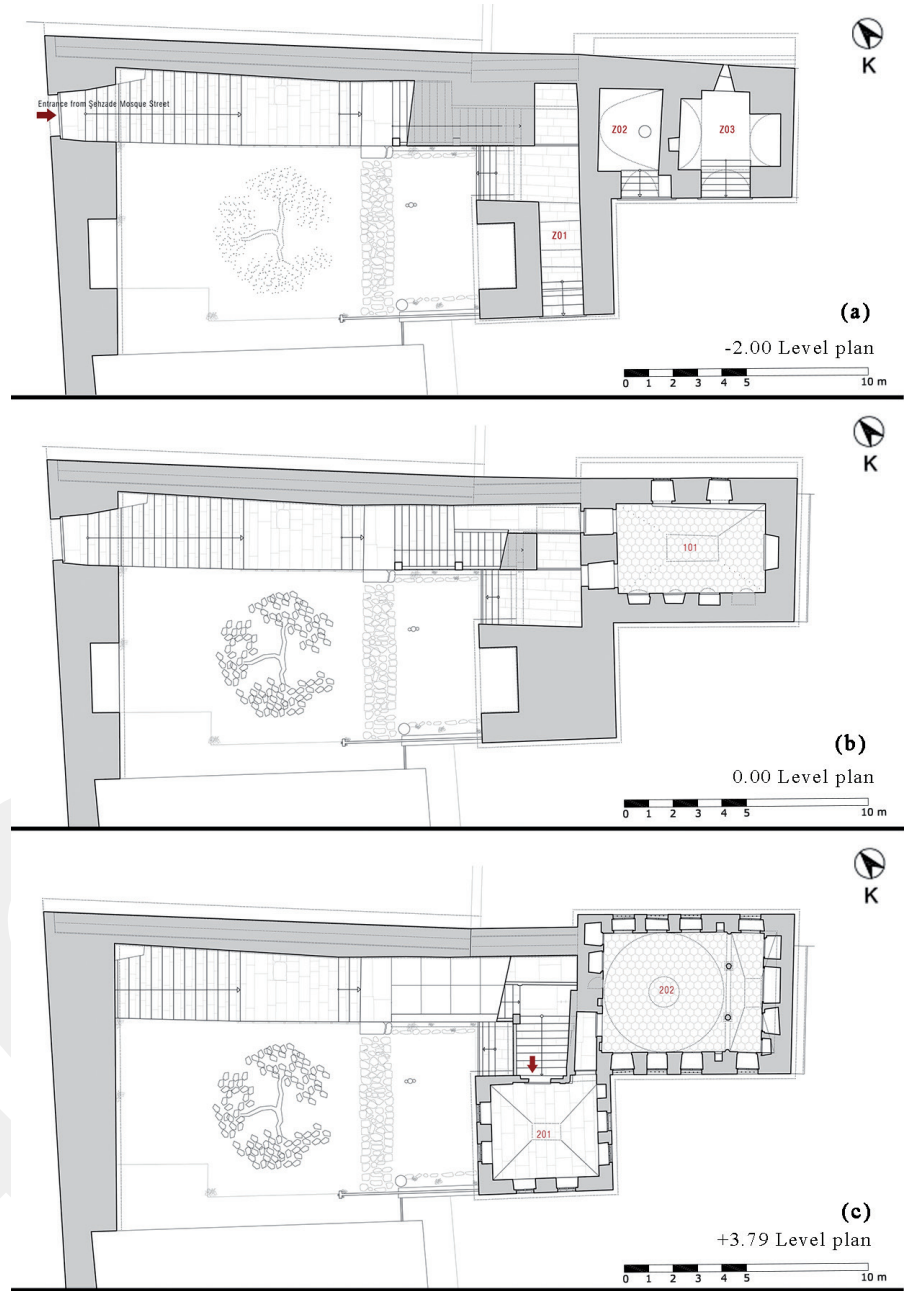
(a) -2.00 Level Plan, (b) 0.00 Level Plan, (c) +3.79 Level Plan, 2012.
